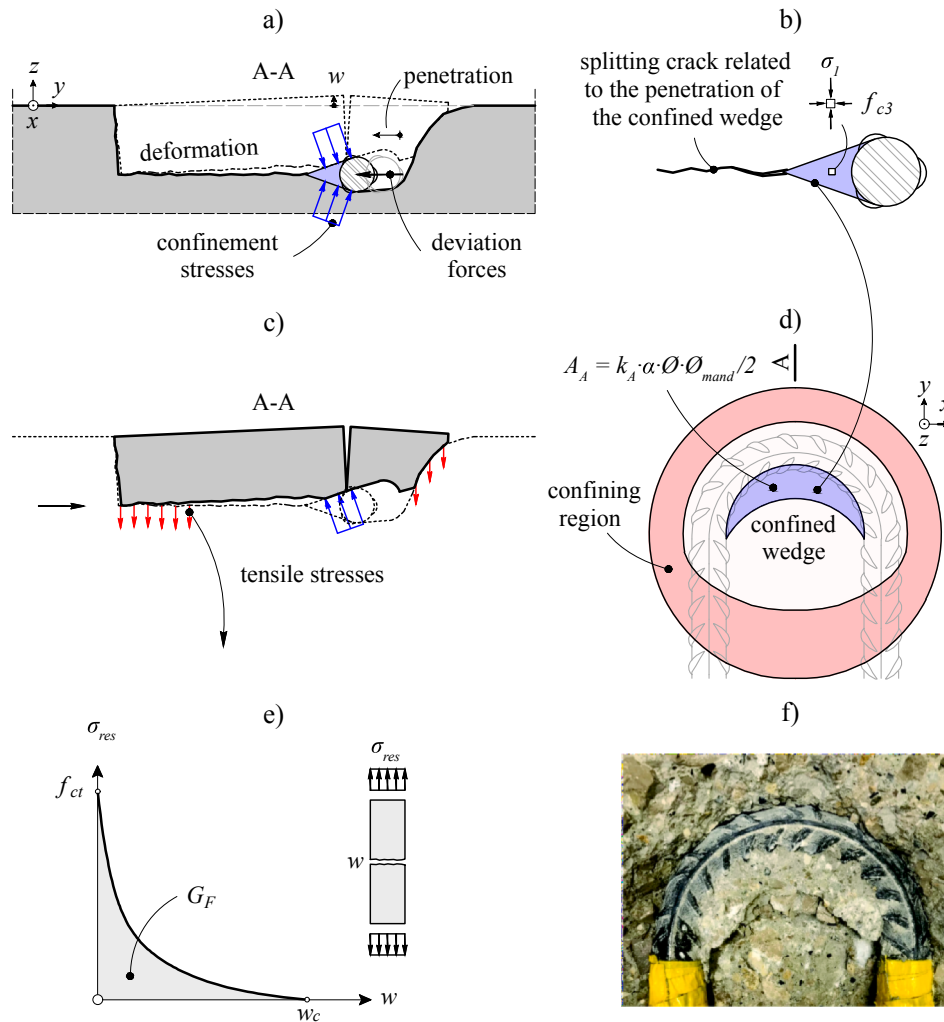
Mechanism of spalling failure: (a) concrete wedge, cover and kinematics; (b) concrete wedge shape; (c) equilibrium of forces; (d) confined wedge and confining region; (e) softening behaviour of cracked concrete; and (f) picture of the concrete wedge observed in test TM16 after cover removal.
